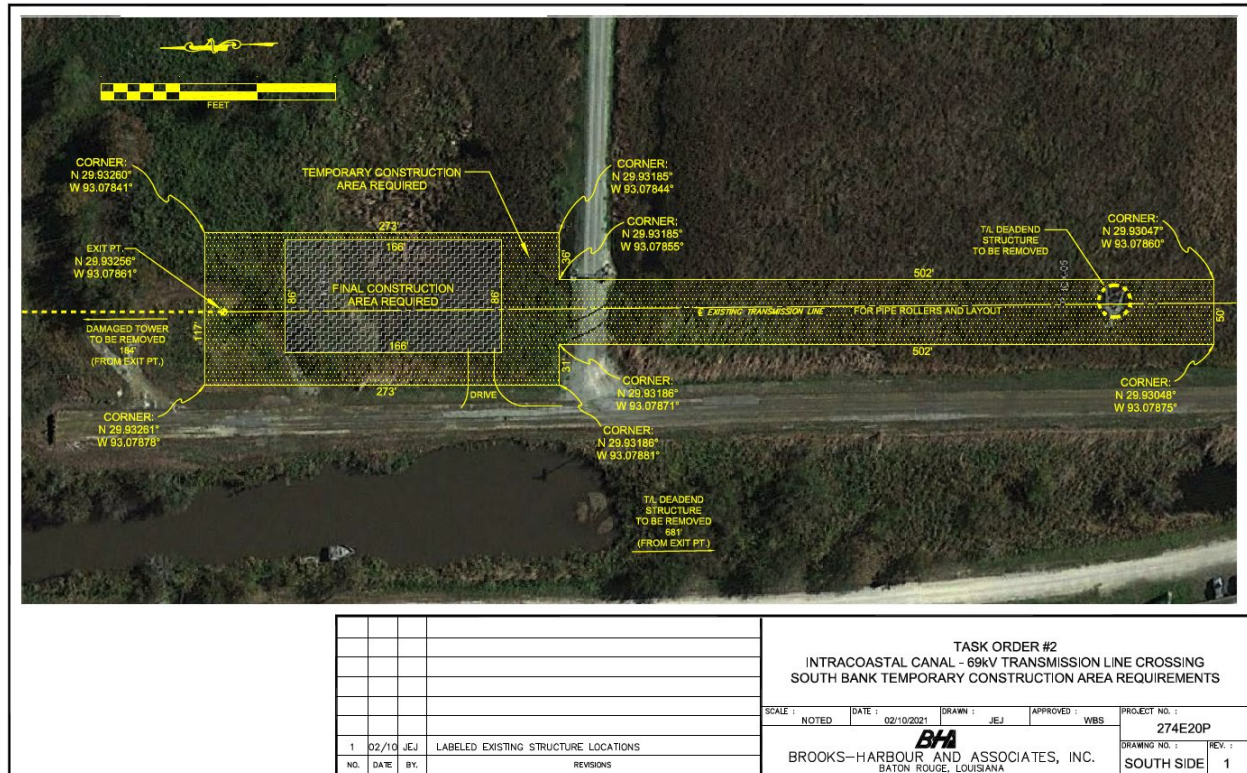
69kV Transmission Line GIWW Crossing South Bank Temporary Construction Area Requirements.
